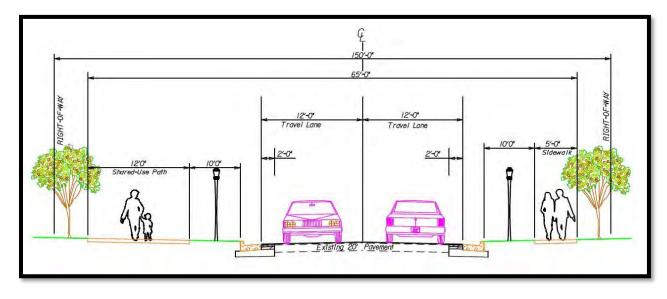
Proposed Typical Section – Alternative 1 – Georgia Ave.
